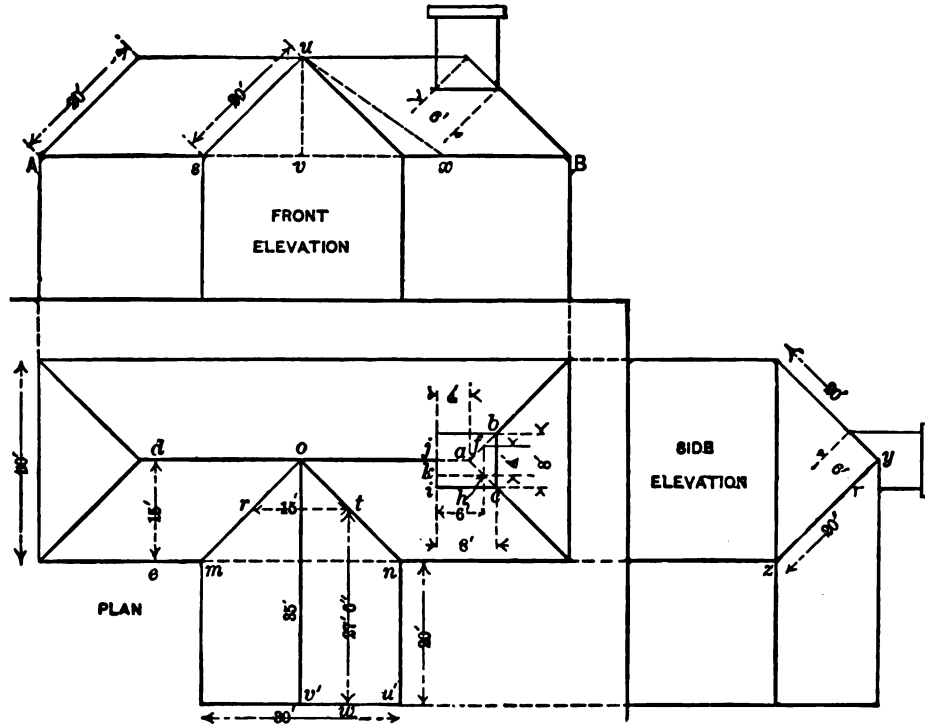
Plan and Elevations of Hip Roof with Wing Attached
